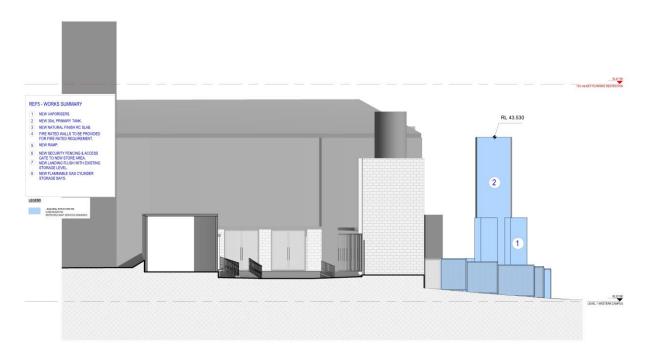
Proposed Elevation 2 (Refer to Elevation 2-2 in Figure 7)
